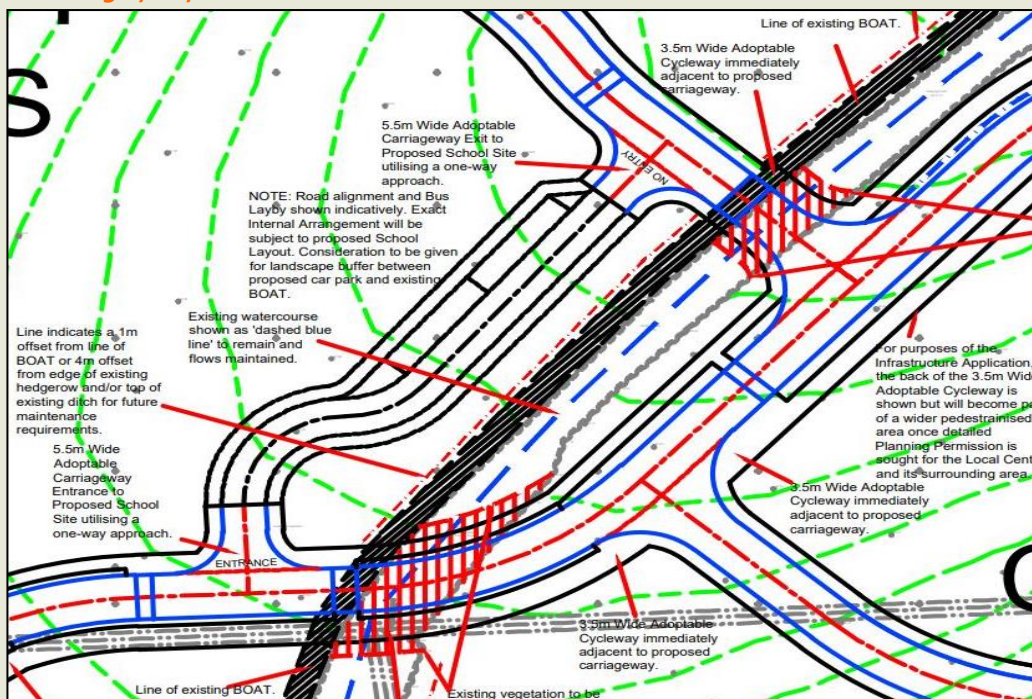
Persimmon Homes Engineering drawing showing the BOAT and line of existing byway.
